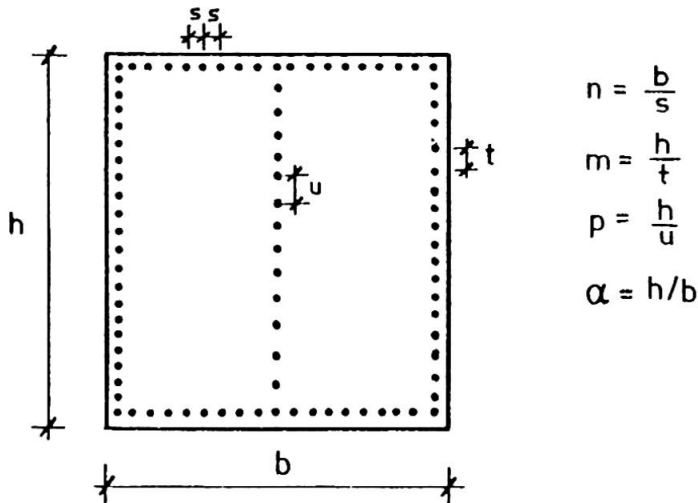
Definition of non-dimensional parameters n , m , and p for fastener spacing for a wall with three vertical studs.
